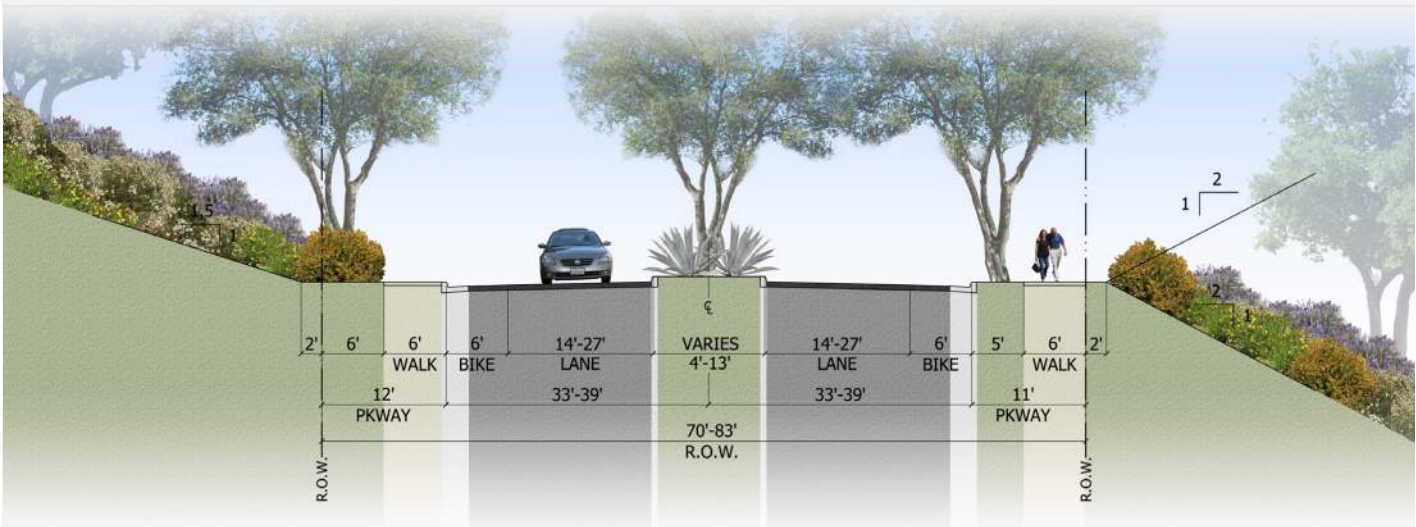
Street Section – Altair Vista (Public, TTM lots C and E)
